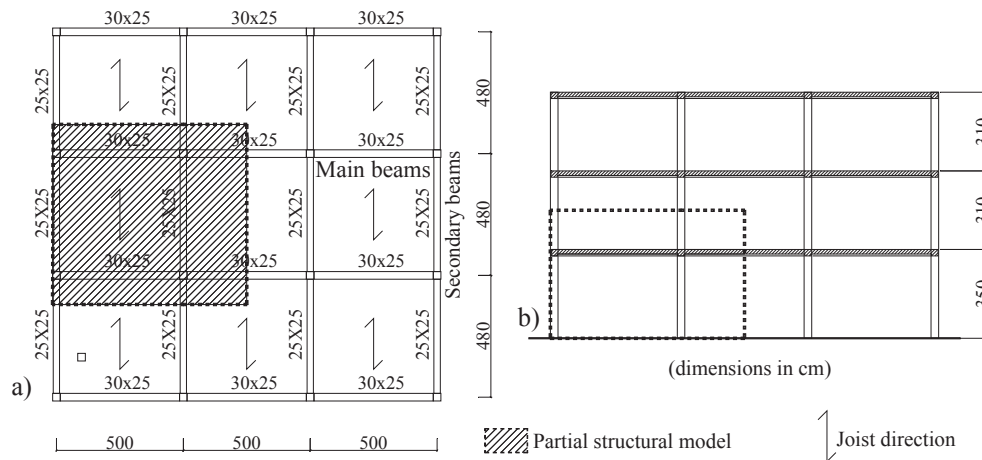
Prototype structure: (a) plan; (b) elevation. Dimensions in cm.
